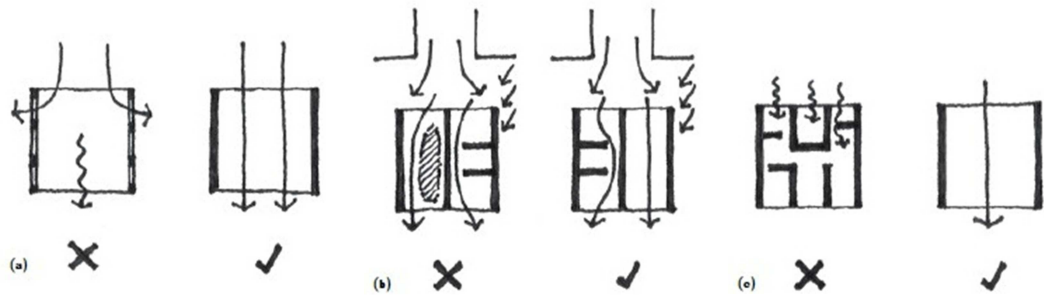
some sample for opening design to provide proper air movement inside buildings. Source: (Chenvidyakarn, 2007)
